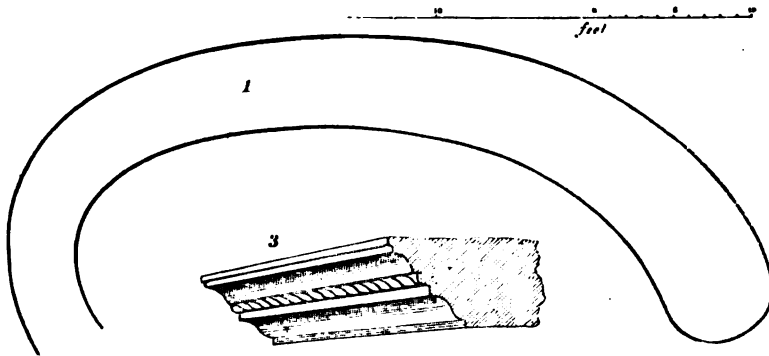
(1) Ground Plan of Underground Building, Newstead, Melrose.
